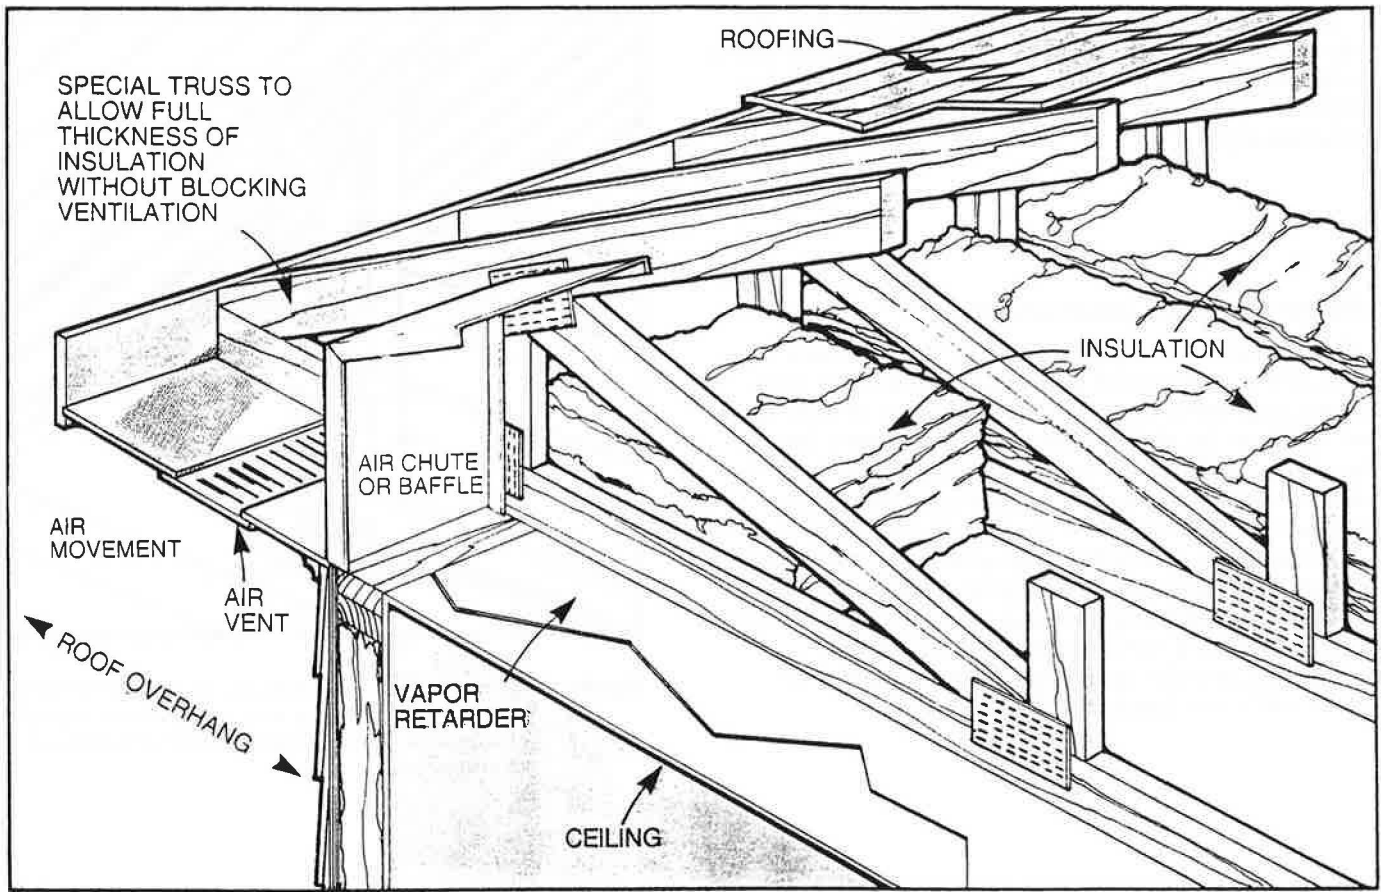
High-heel roof trusses combined with roof overhang allow sufficient space to install ceiling insulation full-depth to the edge of the attic and to provide adequate roof-venting space.
